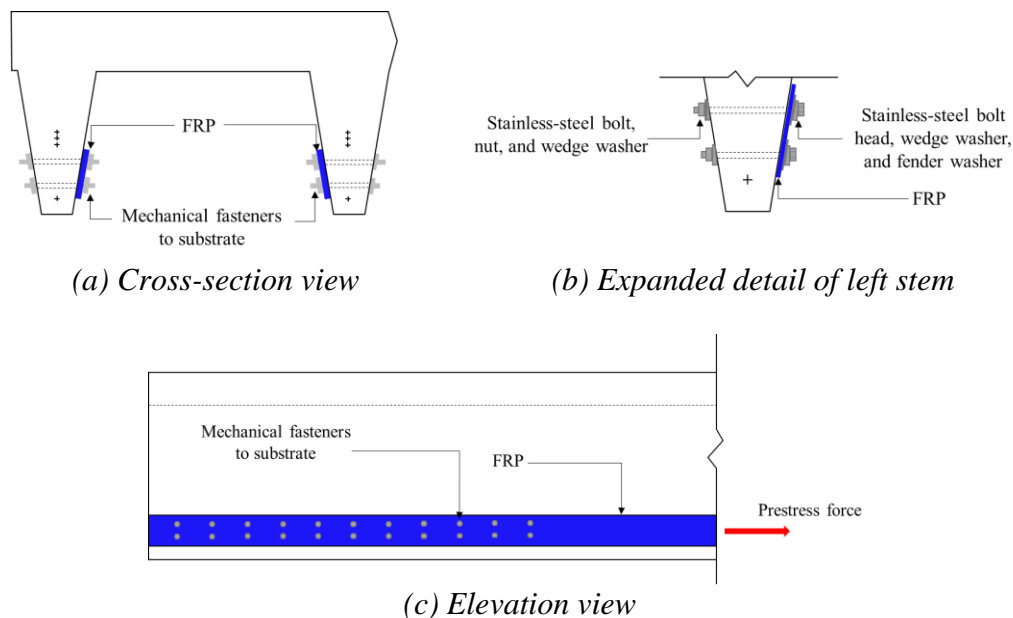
Prestressed MF-FRP retrofit concept sketch.
